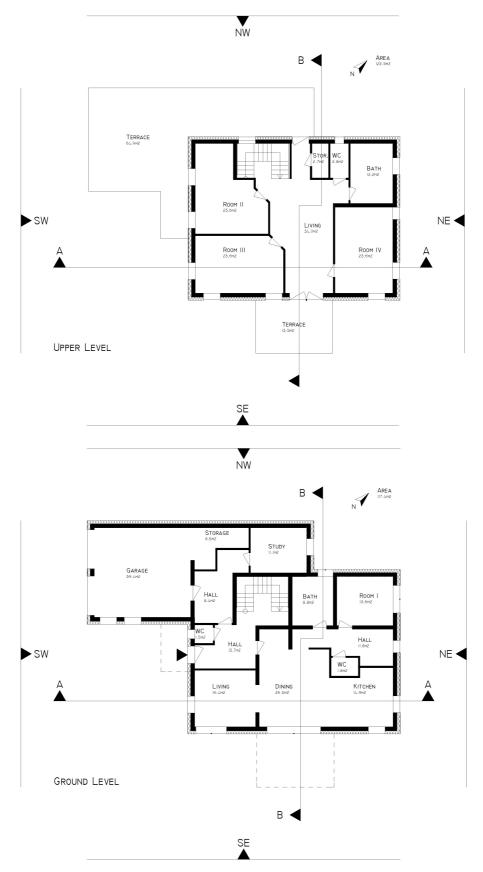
, floor plan of House 2014 – ground and upper level, designed by the author
